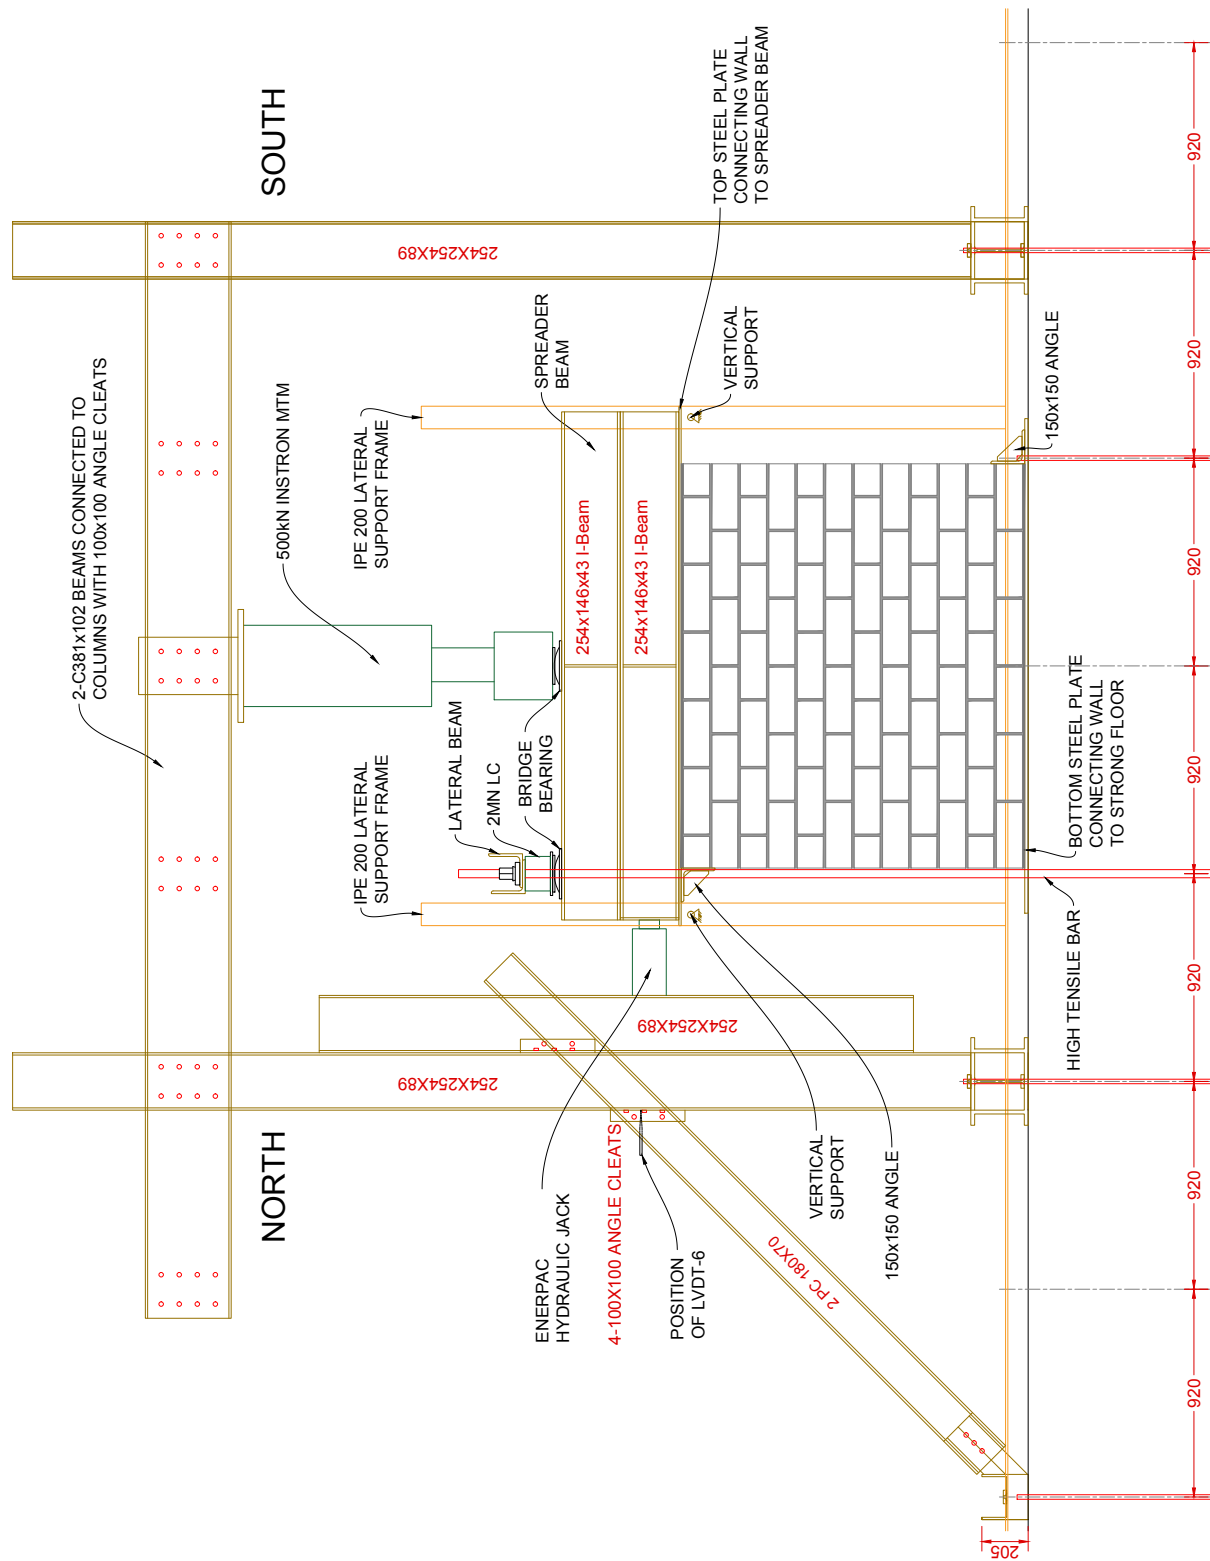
Drawing of Test Set-up B (all dimensions in mm)
